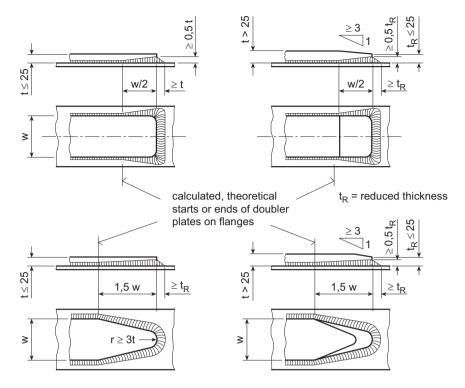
Configuration and welding of the ends of doubler plates on flanges
